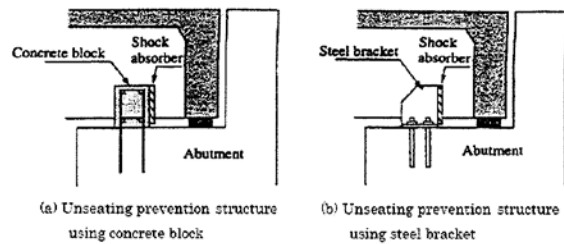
Examples of Unseating Prevention Structures Providing Protruberance on the Superstructure and the Substructure
